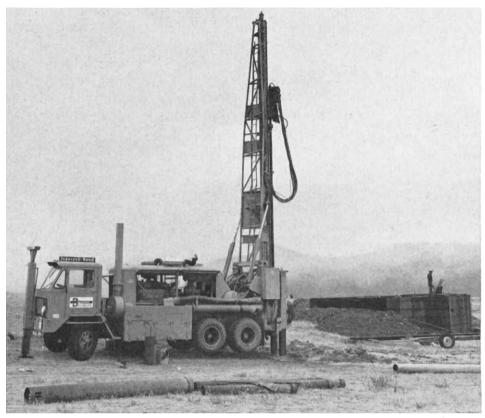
Truck mounted drill. (Ingersoll-Rand Co.)
